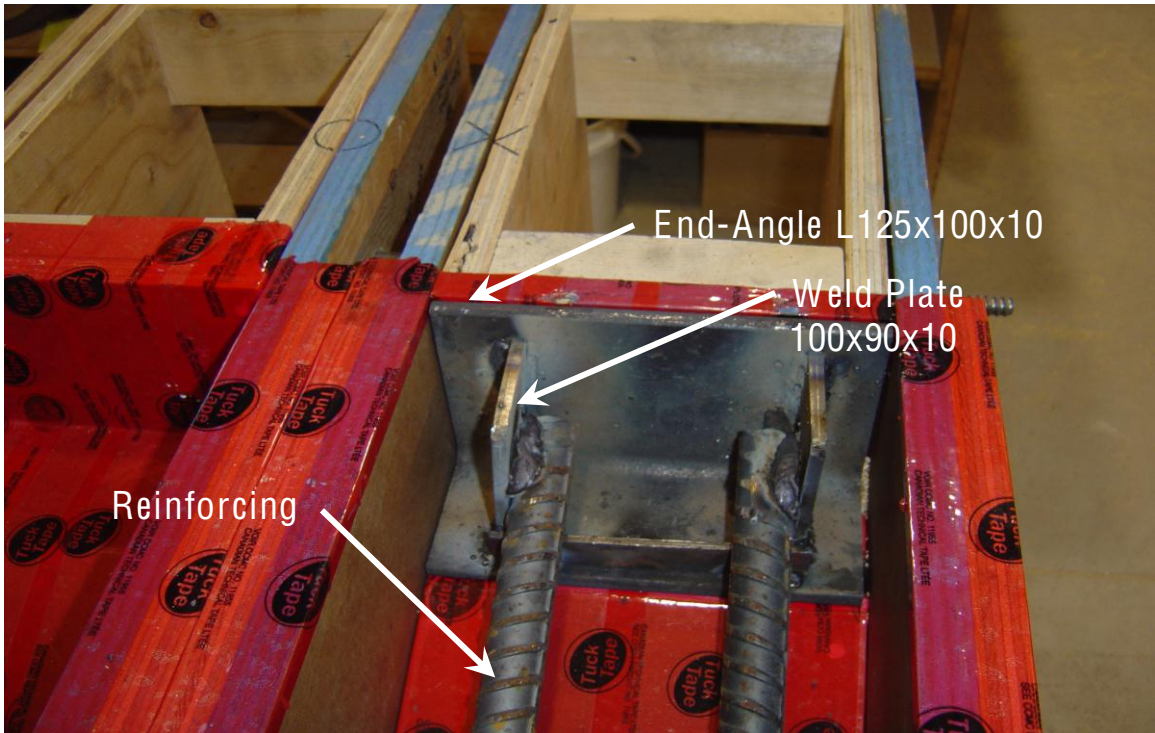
End-angle in place and welded to the reinforcing
